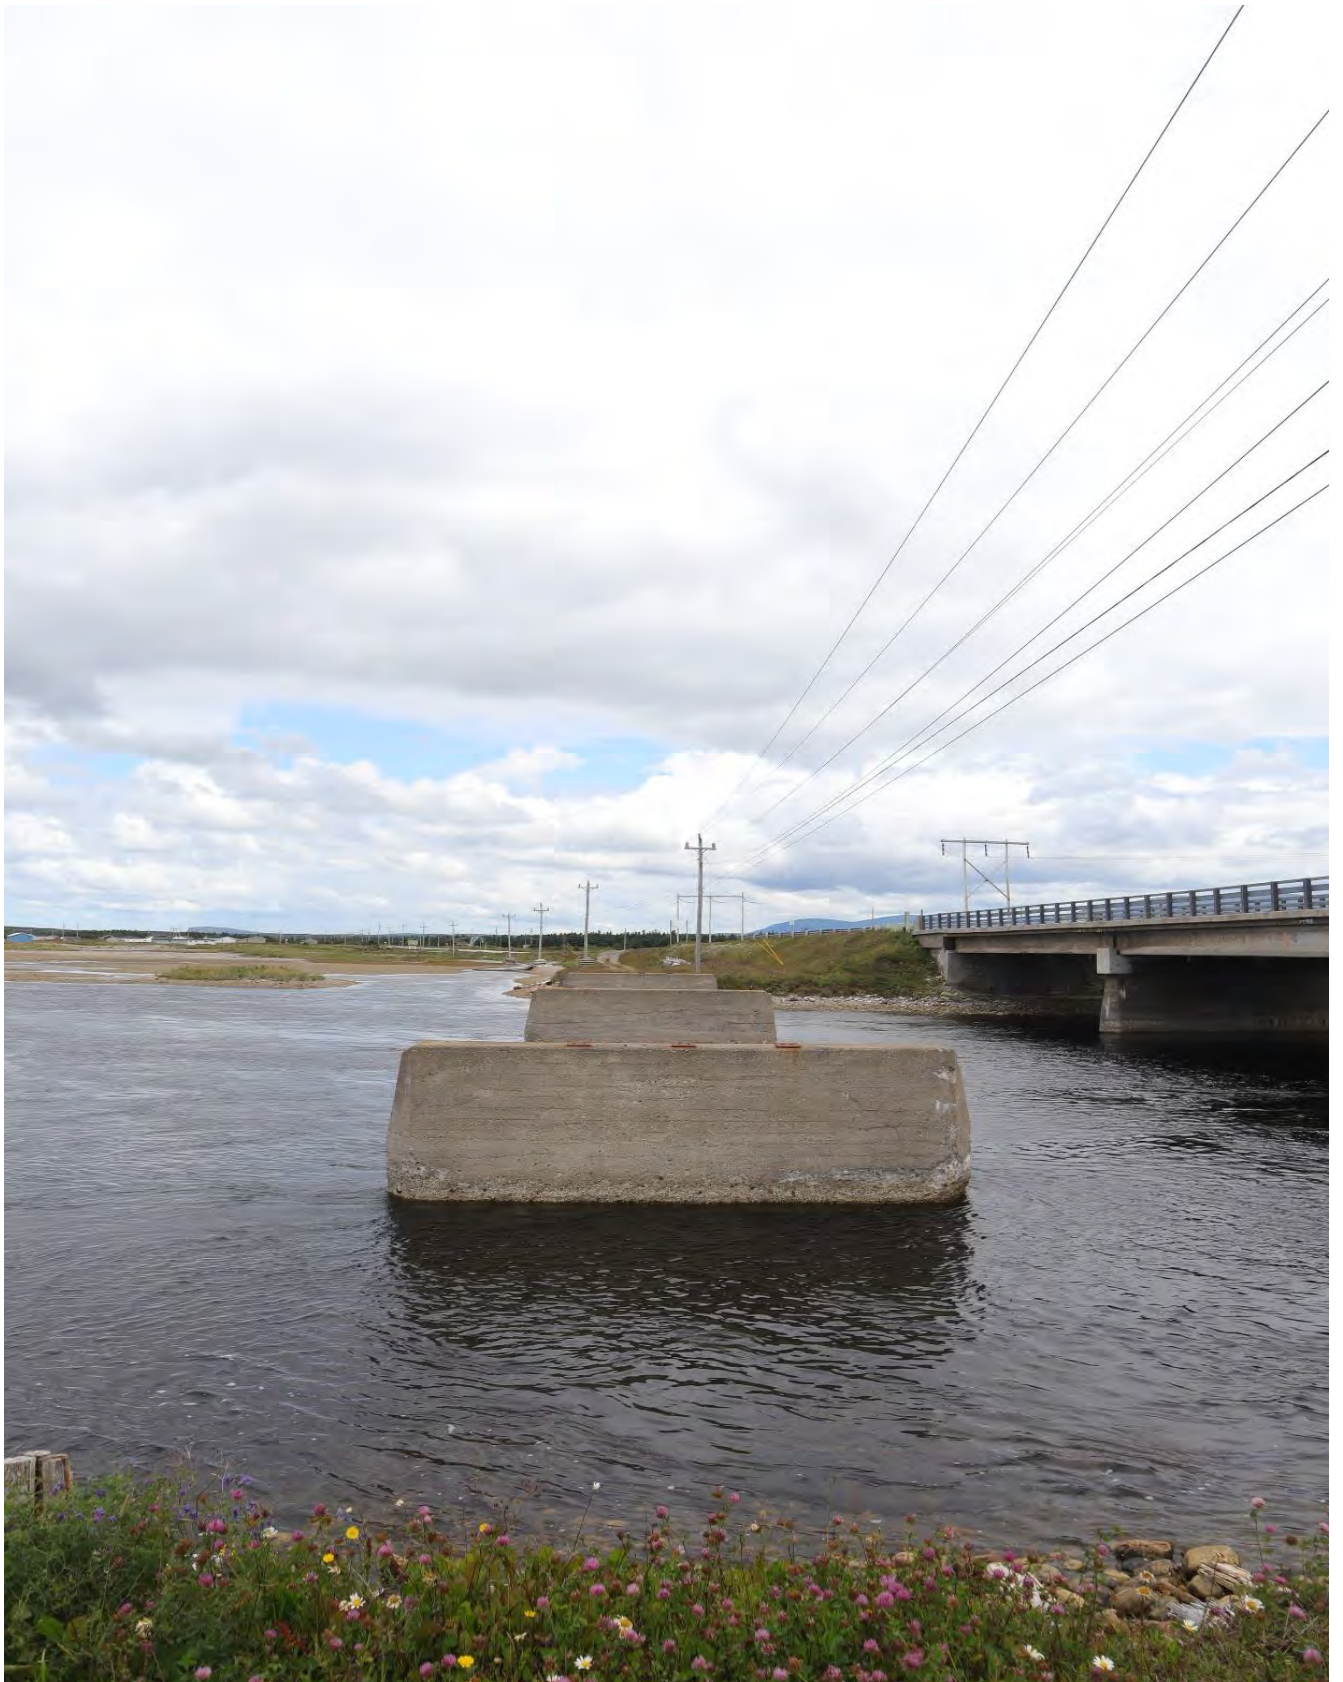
Existing Abutments of proposed Gateway Trail Head bridge.
